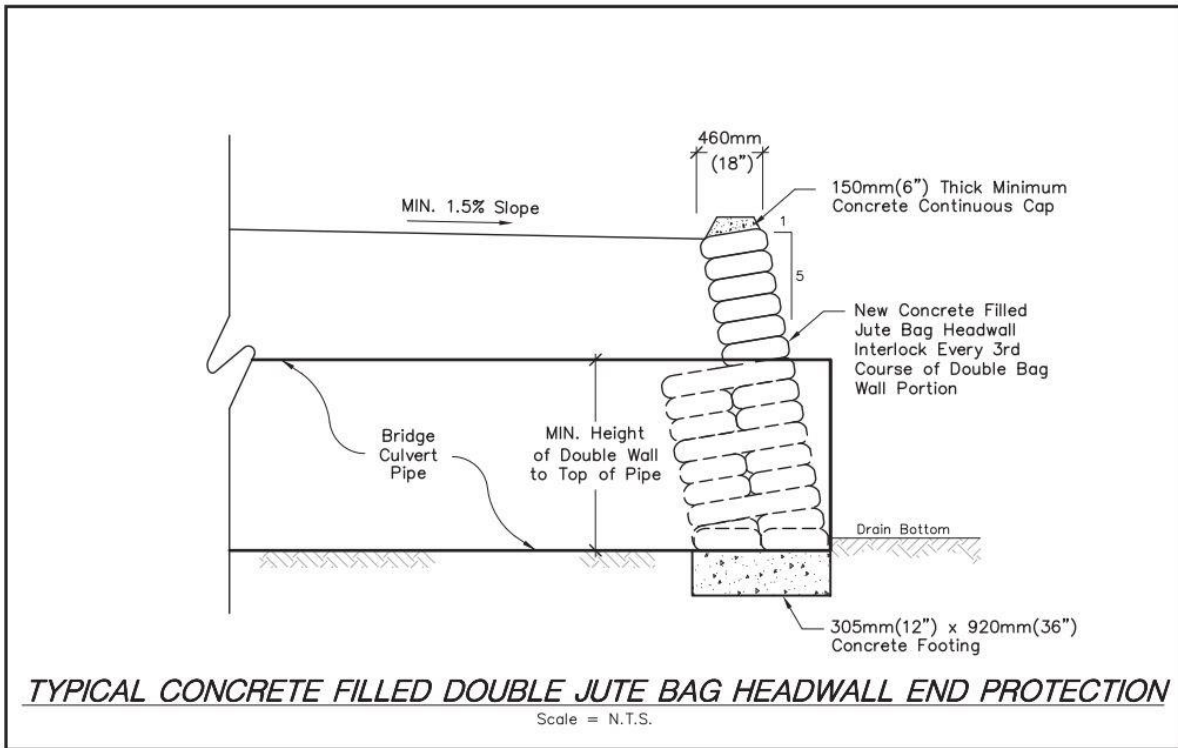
Typical Concrete Filled Double Jute Bag Headwall End Protection
